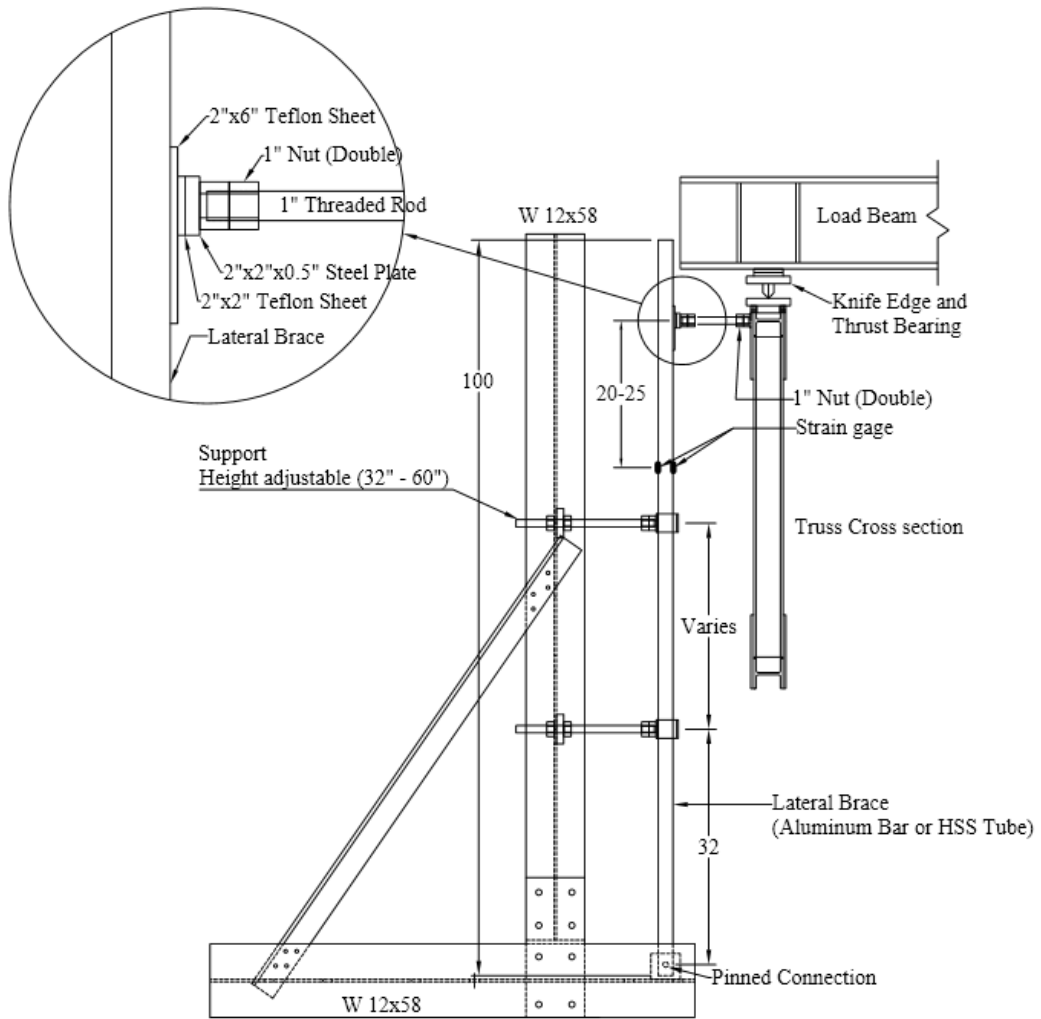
Schematic drawing of the lateral brace attached to the truss and details
